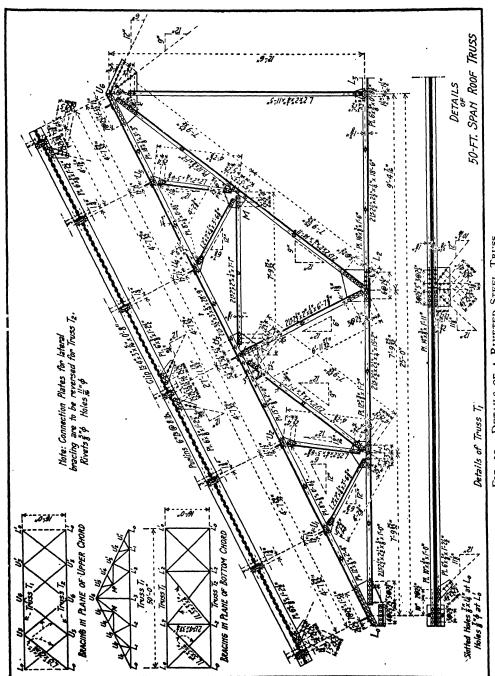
DETAILS OF A RIVETED STEEL TRUSS.
